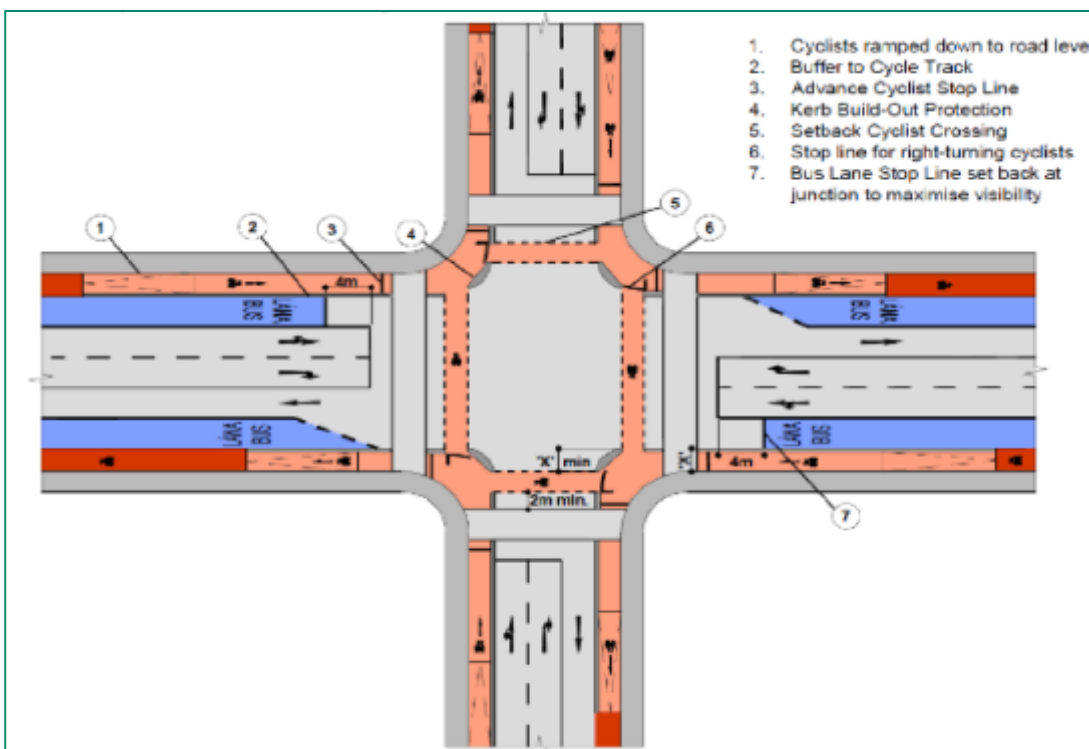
Typical Junction layout from BusConnects Design Guidance Booklet
